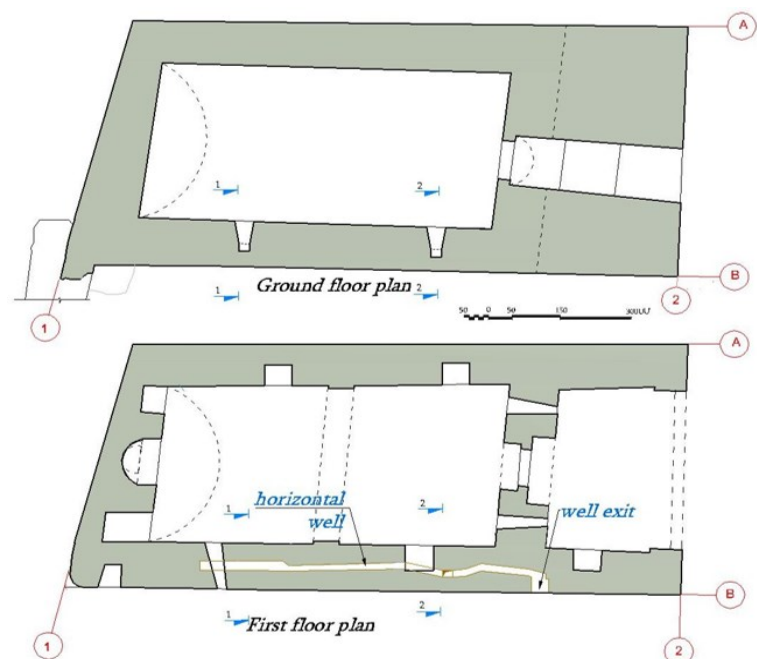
Melik Yegan's reception hall, basement, and first-floor plans by M. Sargsyan, R. Kharazyan
